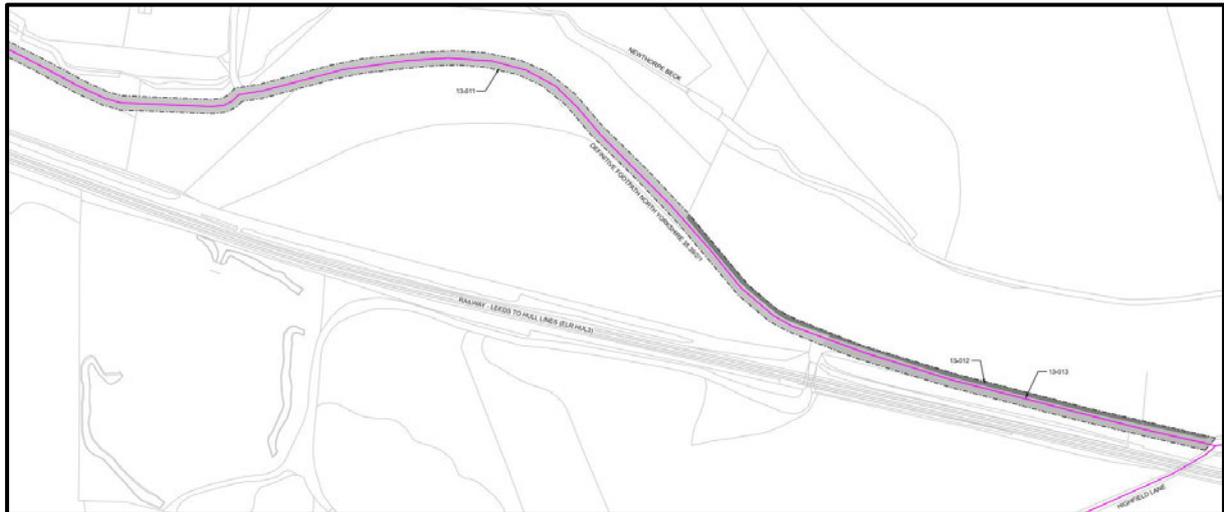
Extract of Works and Land Plan Order Sheet 14 (NR09)
